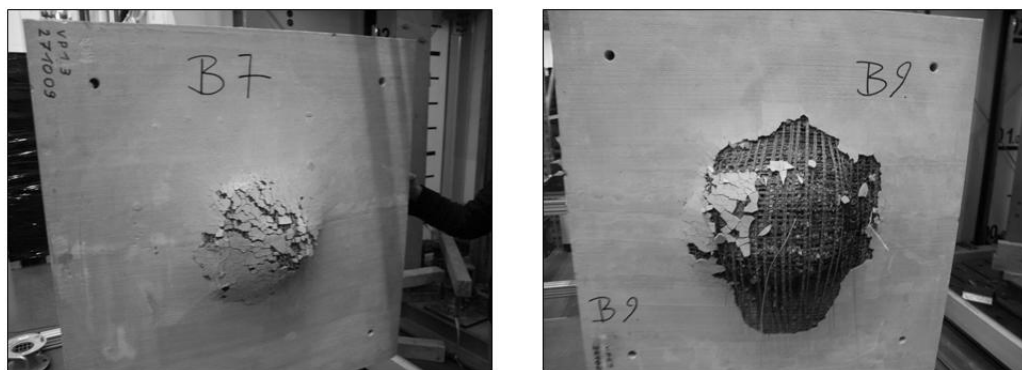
Standard concrete slab with additional steel fabric (B7, left) and with carbon fabric (B9, right) (Source: Hummeltenberg et al., 2011)
